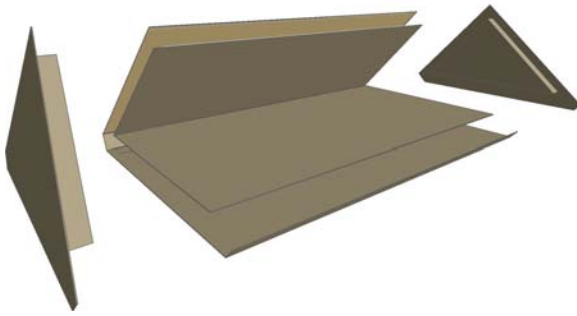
Cardboard used as drywall, siding, insulation, and door material.
